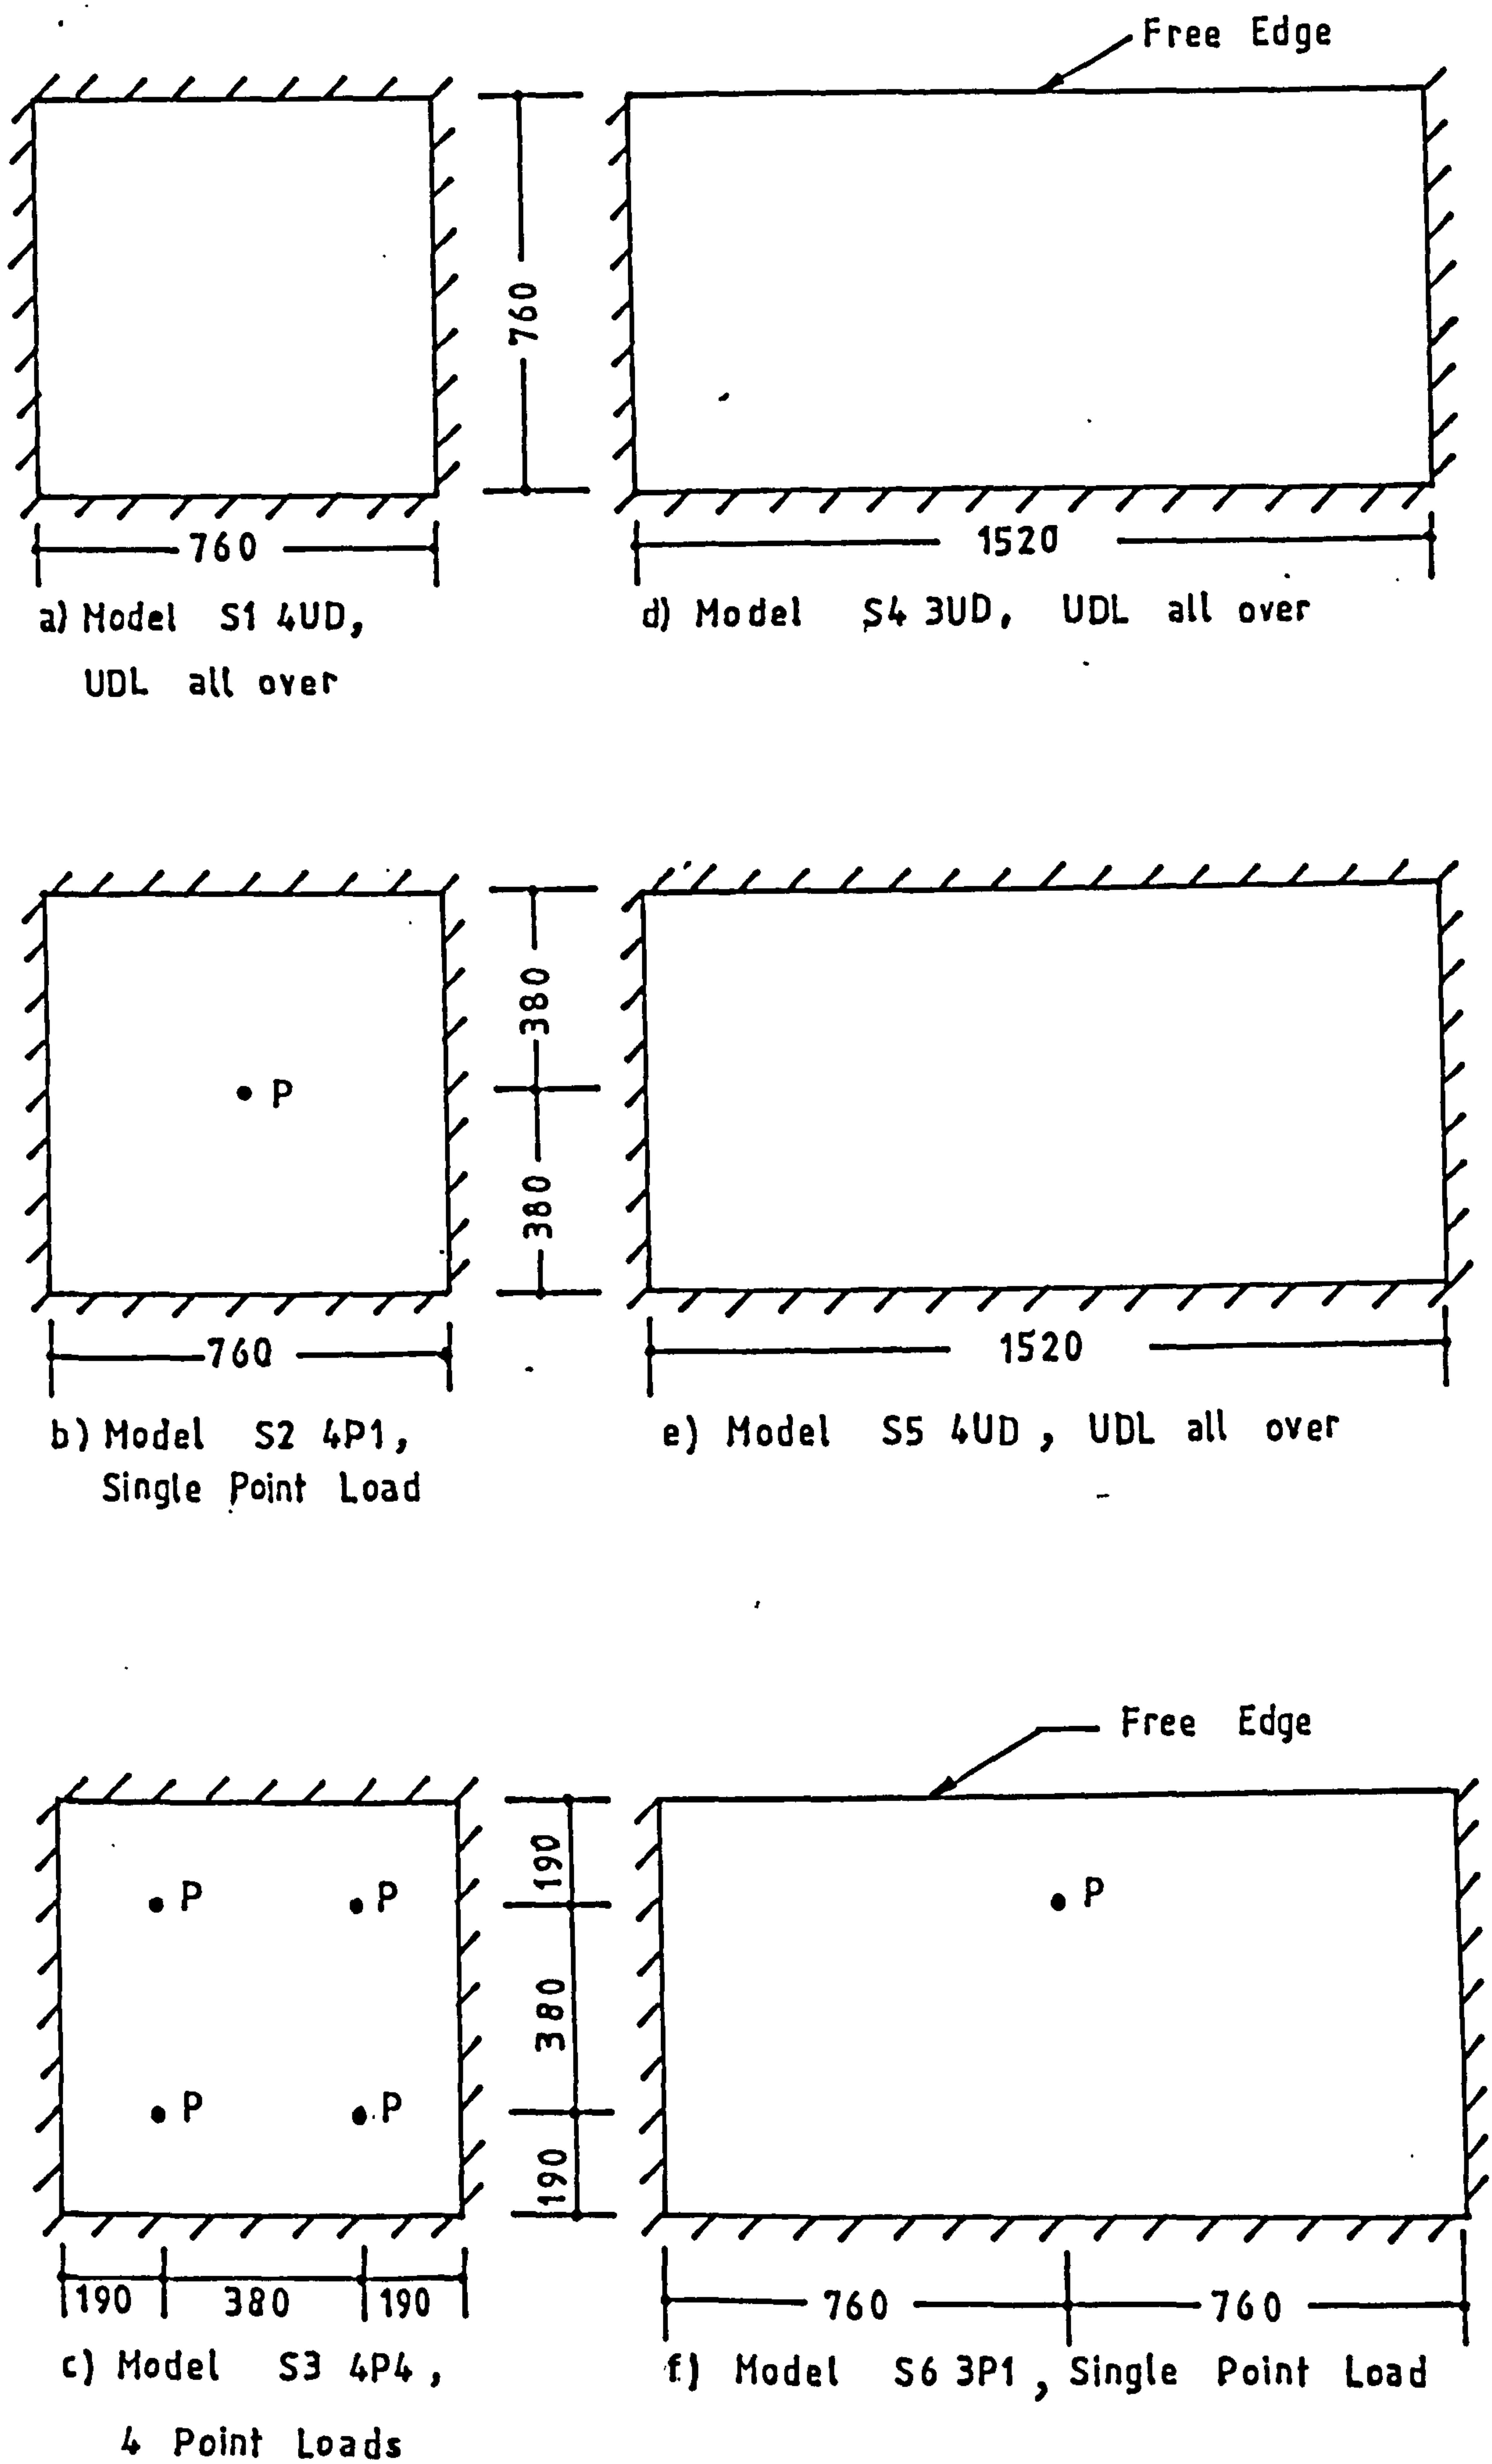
Support conditions and Loading arrangement for the Test Slabs.
